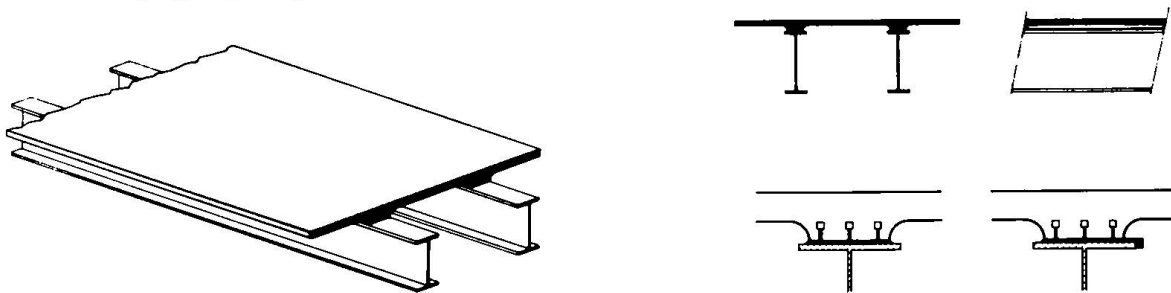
A precast concrete slab precast on two steel plates, with a later welding to the steel structure below.
